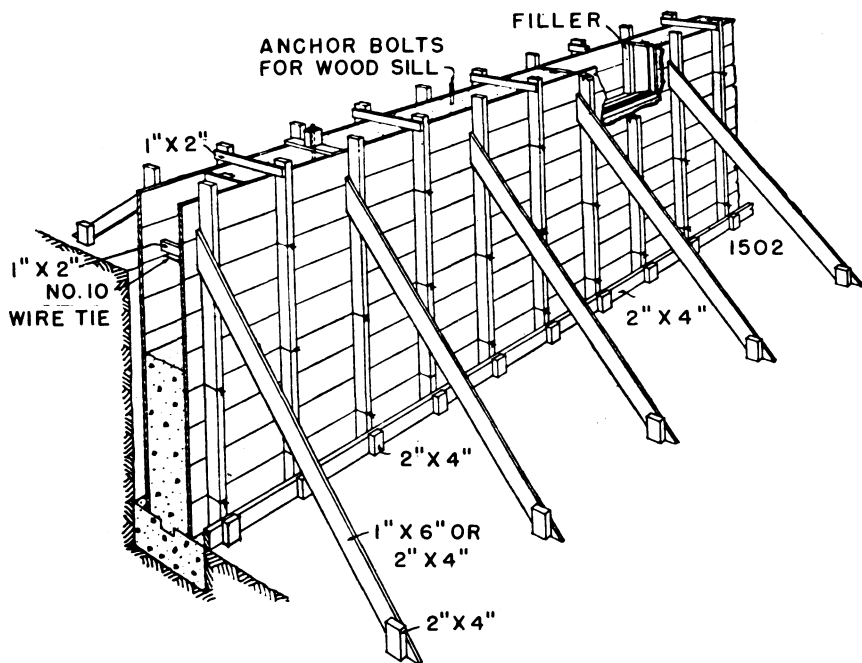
Forms for a basement or cellar wall. The earth can be used as the outside form if sufficiently firm.
